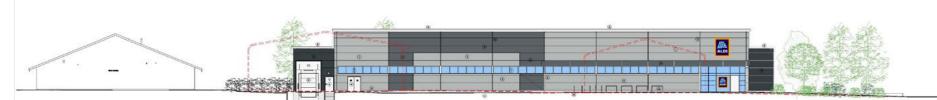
Proposed west elevation, illustrating proposed Aldi building and outline of existing buildings
